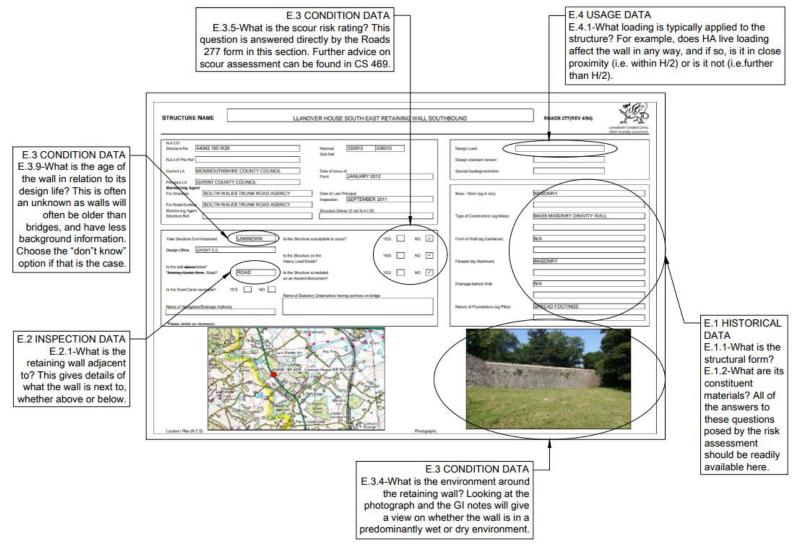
Using the Form Roads 277 to risk assess retaining walls (1 of 2)
